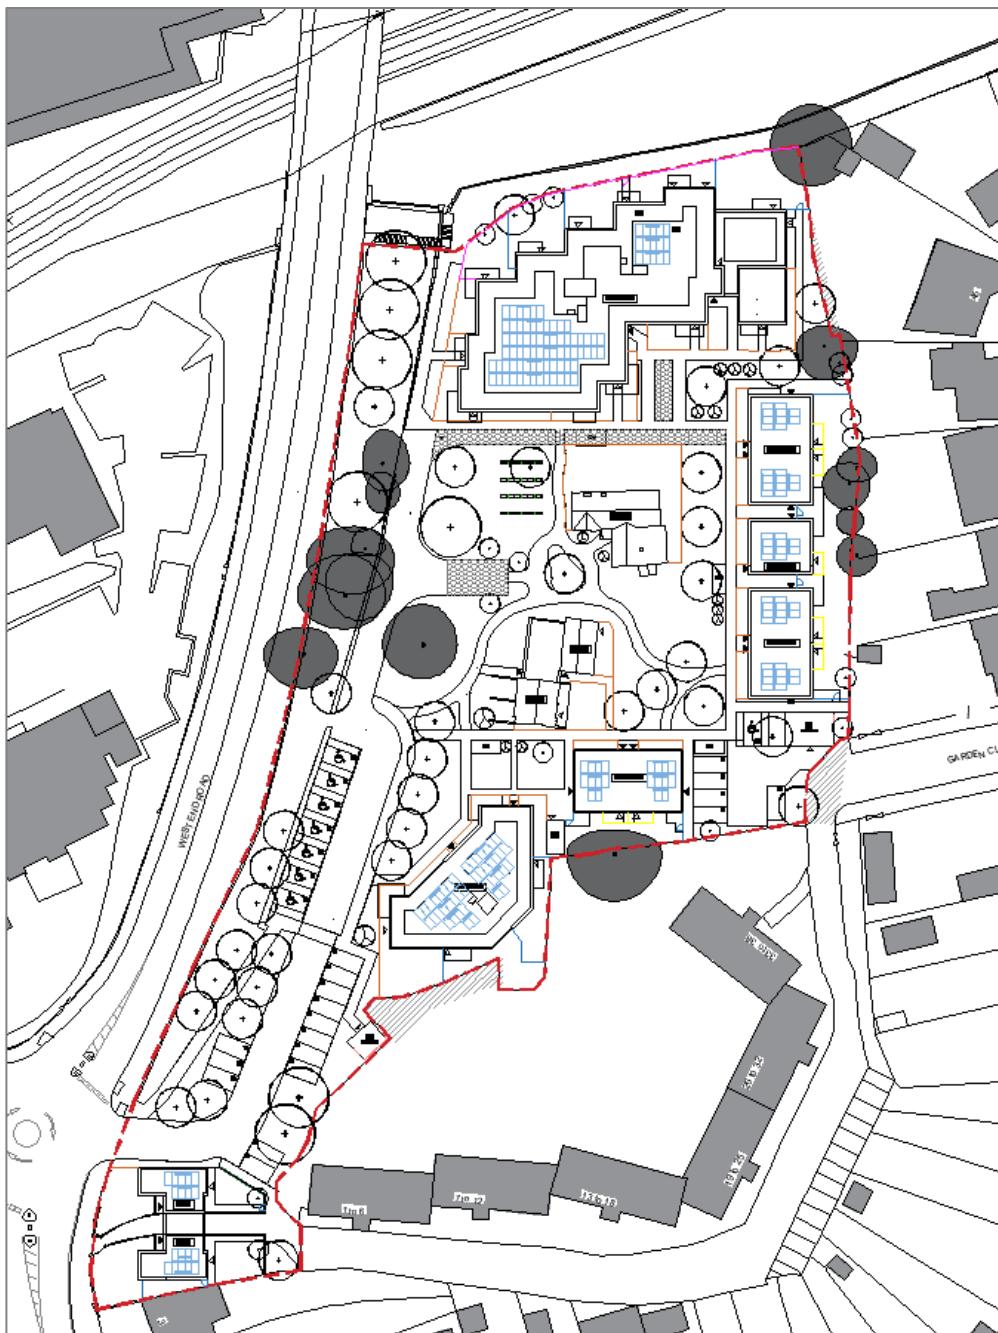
Proposed Block Plan (source: CMYK (Planning & Design) Ltd, August 2024)
